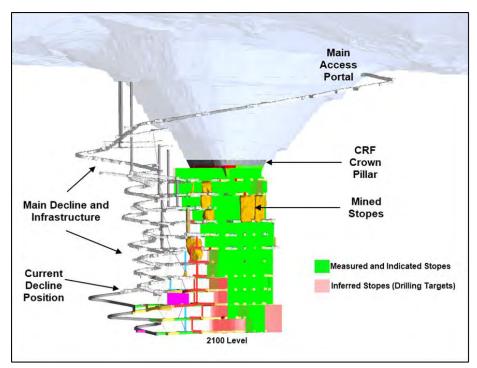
Underground Mine Design, Cross-Section View Looking North-West
